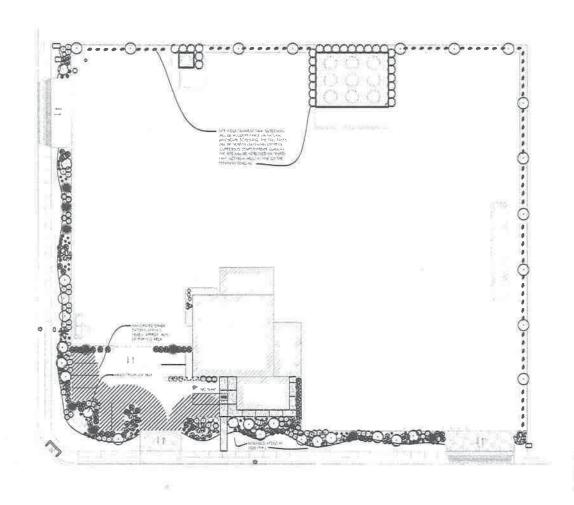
EXHIBIT E LANDSCAPE PLAN PD 02-012 Coastal Crop Care
